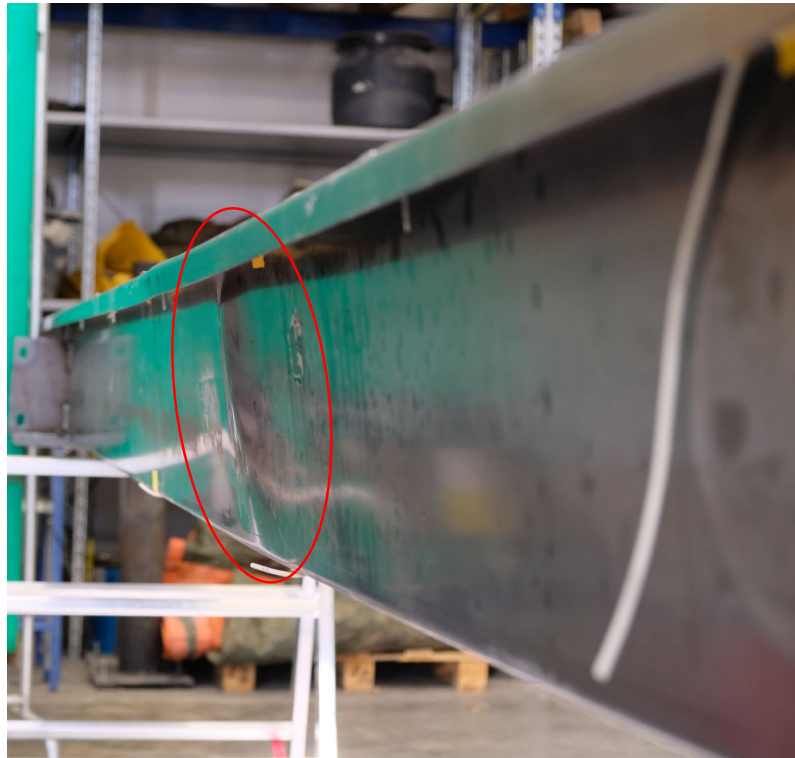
Deformed shape in flange buckling after failure
